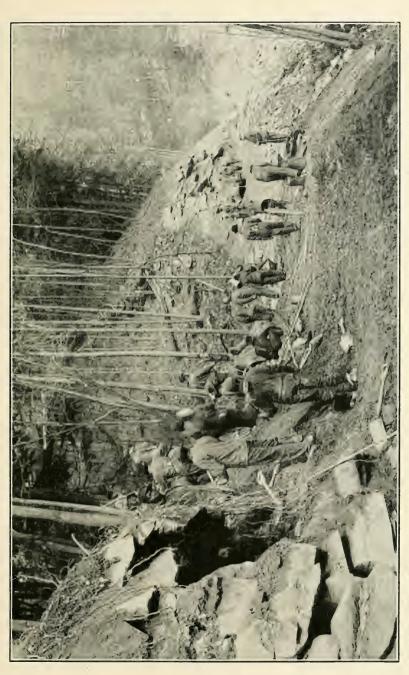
PLATE XIX—Showing prisoners at work grading new public highway along Elkhorn Creek, between Welch and Kimball, on the outcrop of a heavy sandstone ledge of the Pocahontas Group. Photo by courtesy of W. J. McCharen, Road Engineer, McDowell County.
